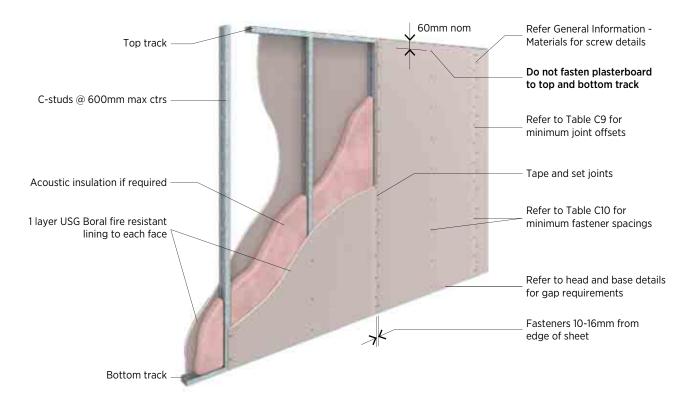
Fire Rated Steel Stud - Vertical Fixing - Single Layer
